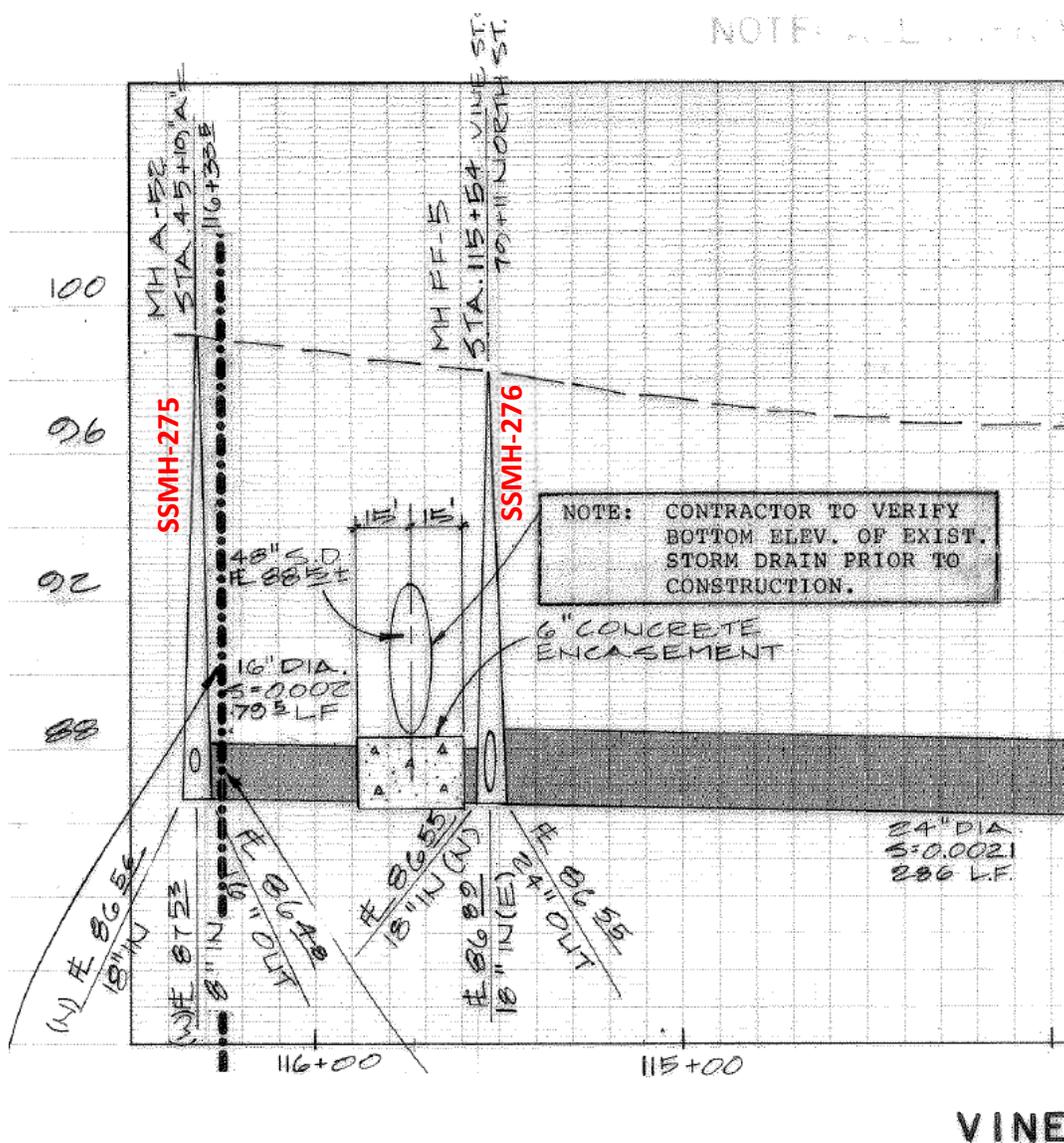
Existing 48" Storm Drain Utility Crossing at Vine/North Street Intersection
